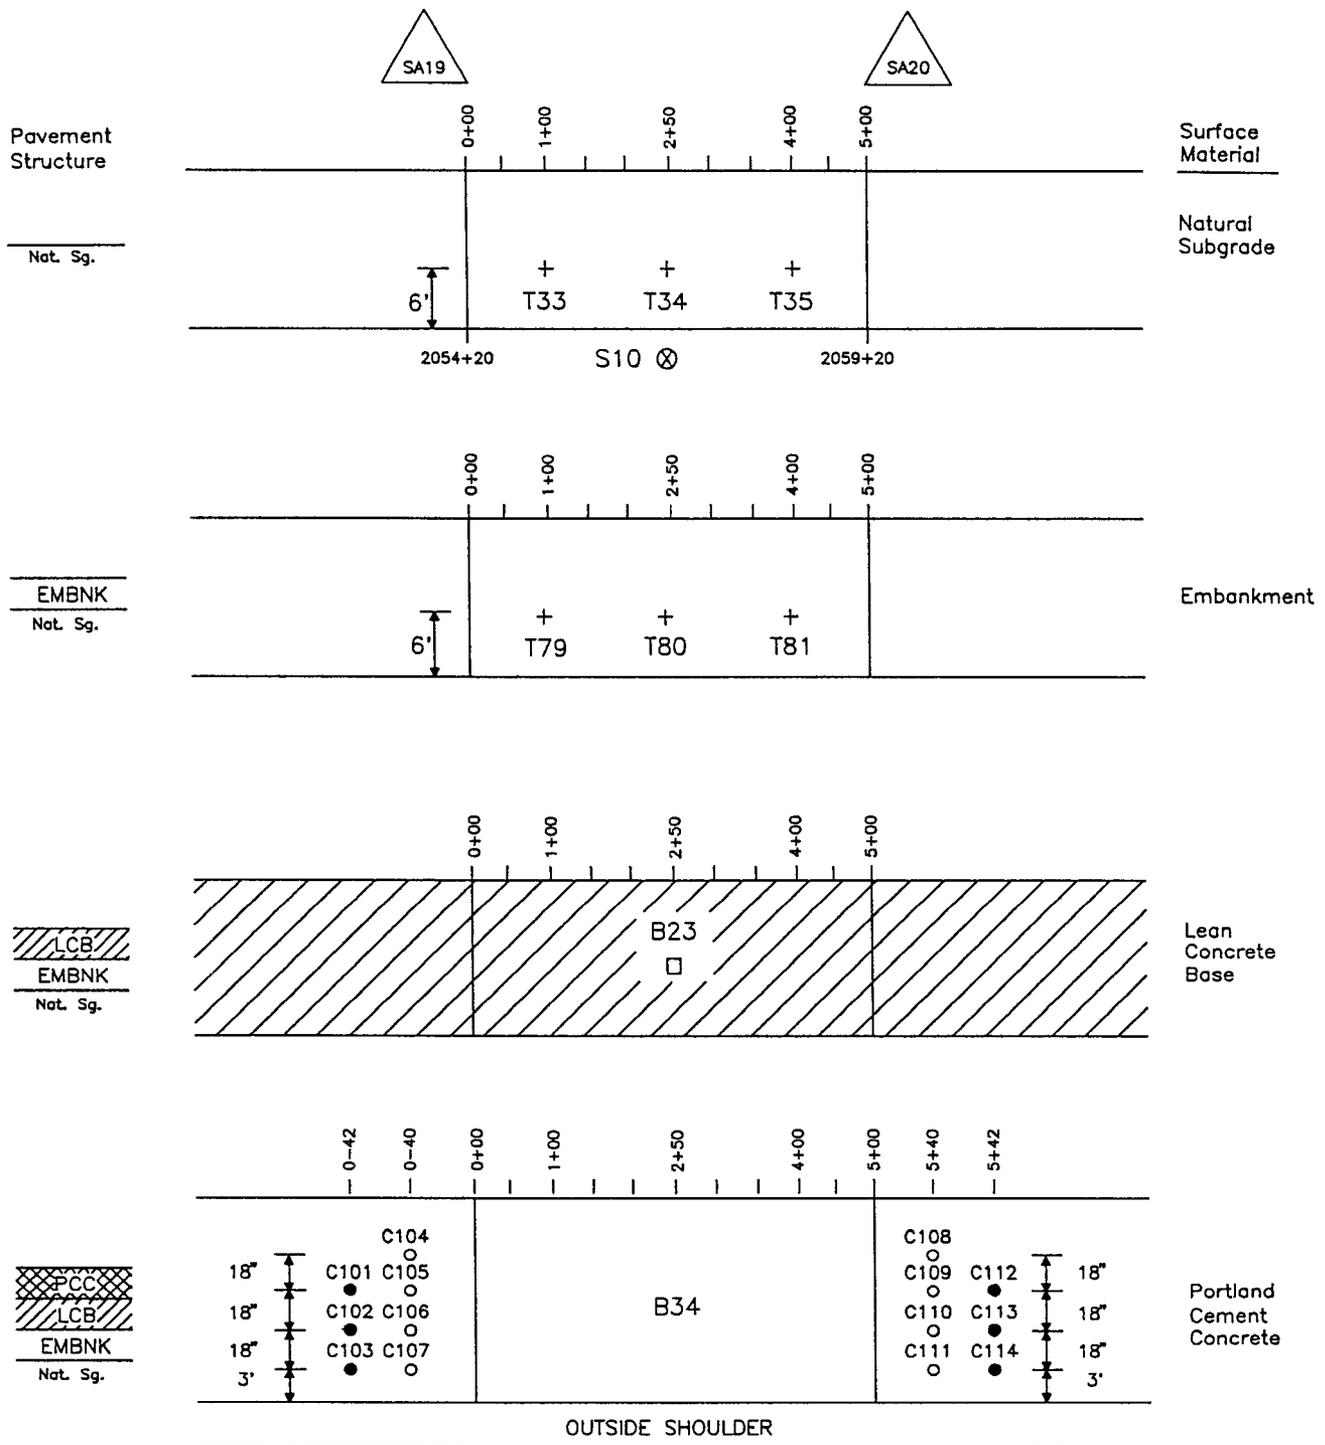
Sampling and test plan for test section 530204, SPS-2 Washington
